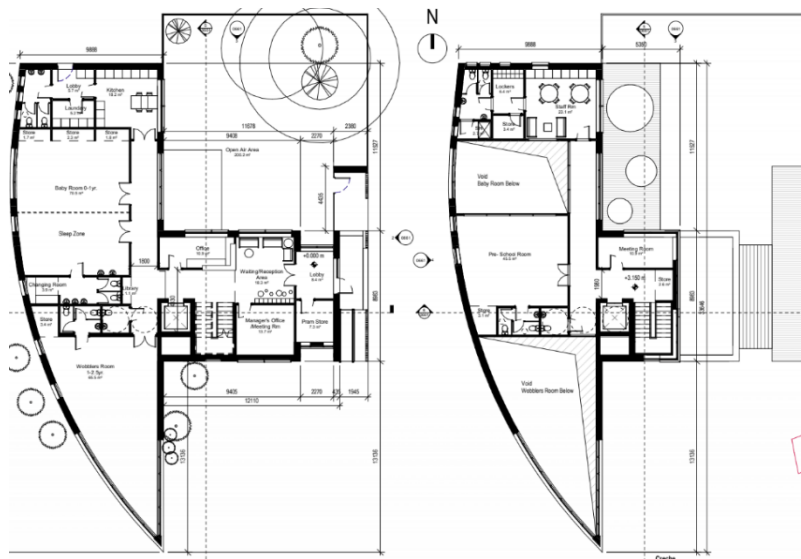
Ground (left) and first (right) floor plans of the proposed Hampton North Creche unit.
